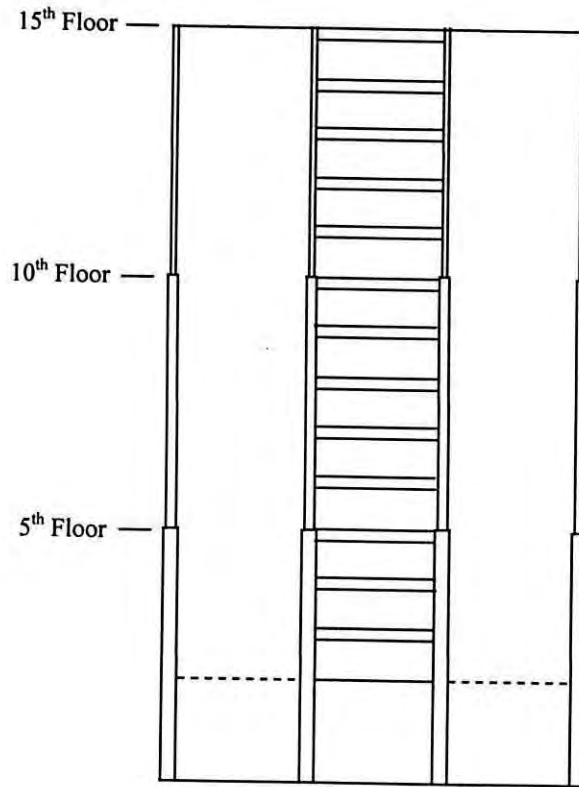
Cross-section A-A of the Structure Shown in Fig. 6.1.
